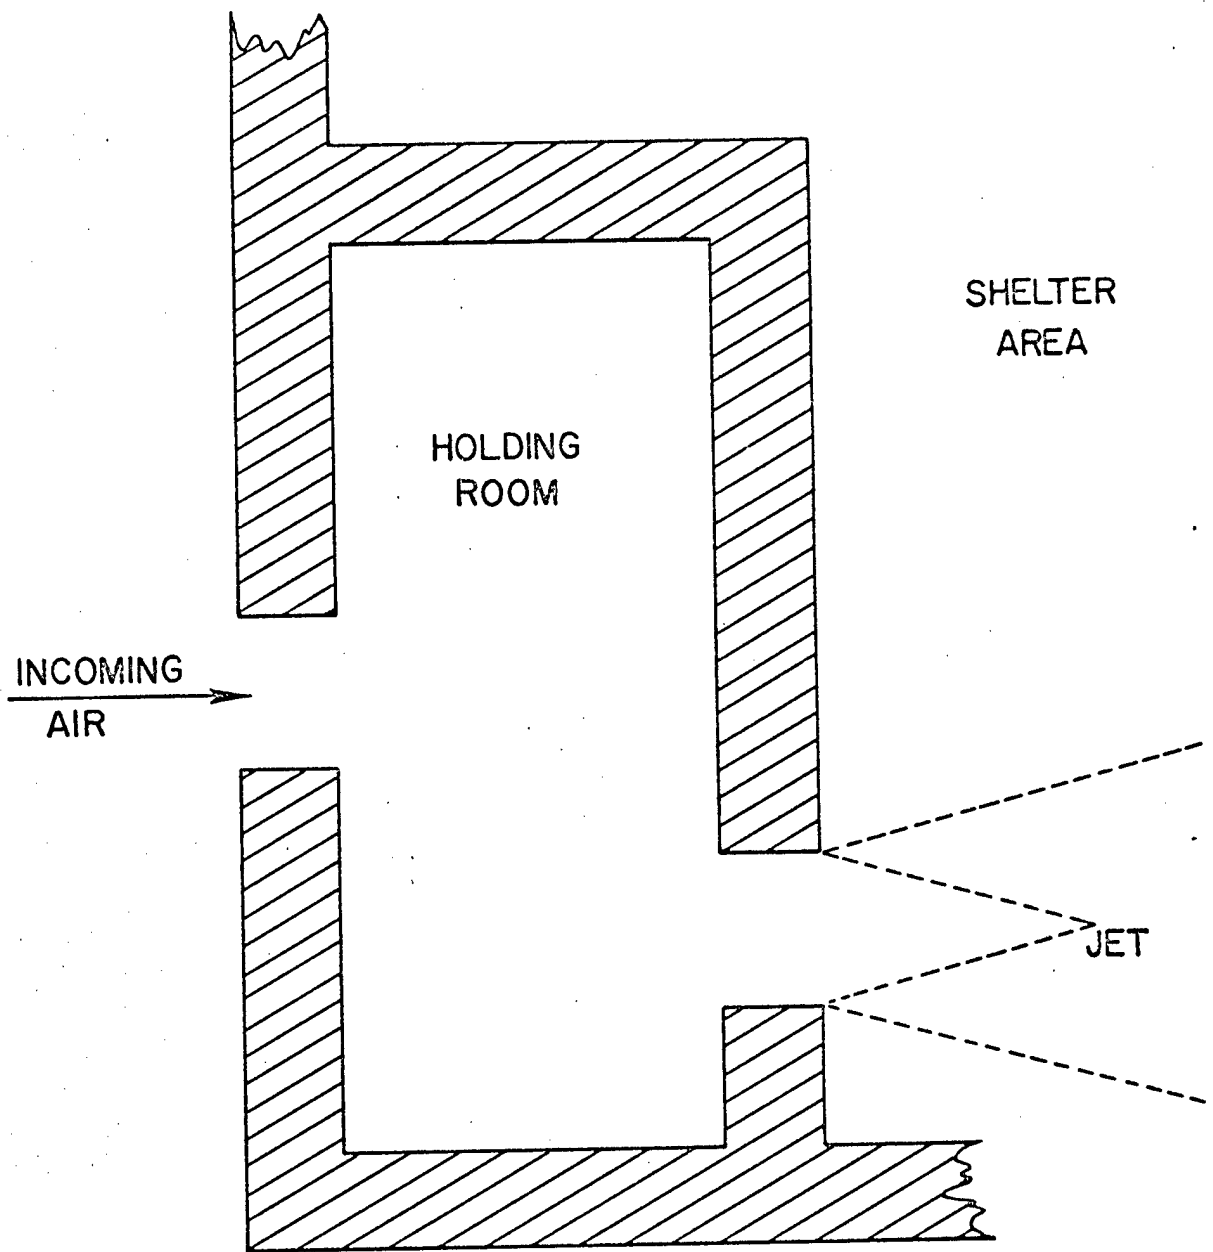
E IMPROPERLY DESIGNED HOLDING ROOM
